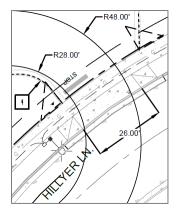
Sheet C5.1 Fire access plan excerpt
